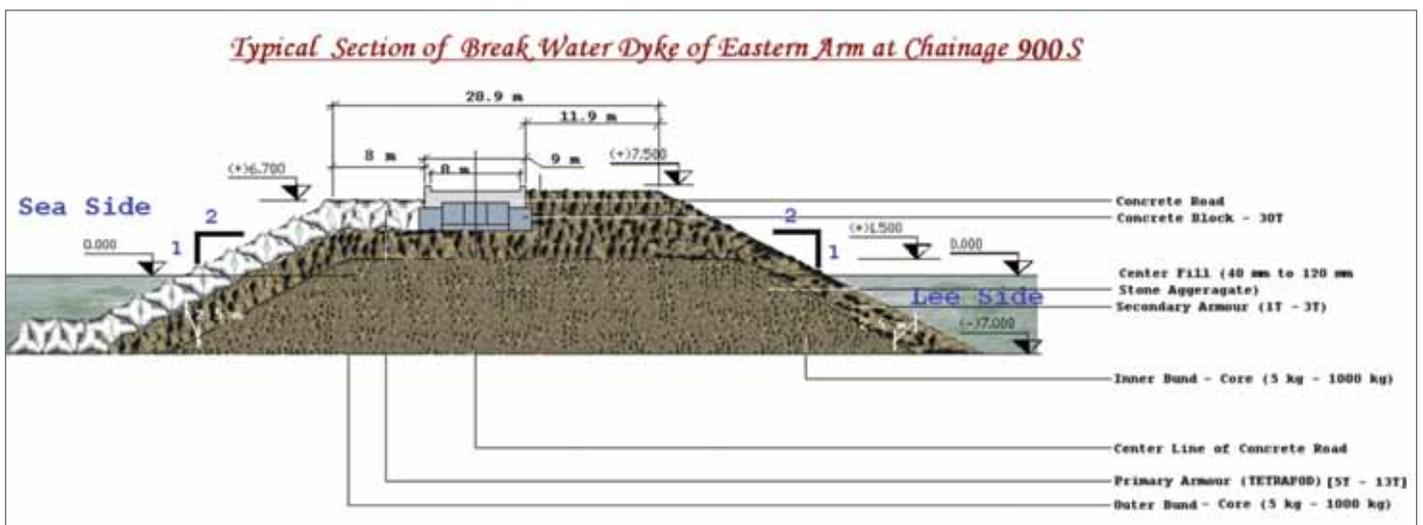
Typical cross section of breakwater dyke of Eastern arm at Ch. 900 S (non-sheet pile section)
